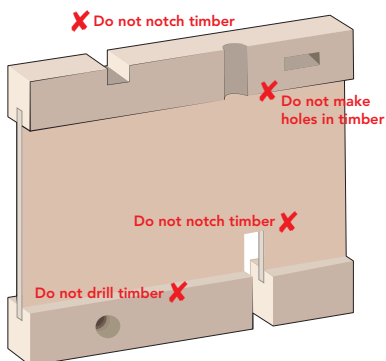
DRILLING/NOTCHING OF TIMBER-ENGINEERED JOISTS
